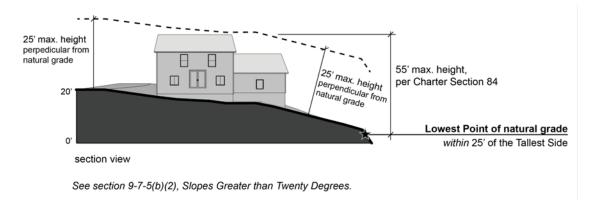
Building Height on a Slope Greater than Twenty Degrees
